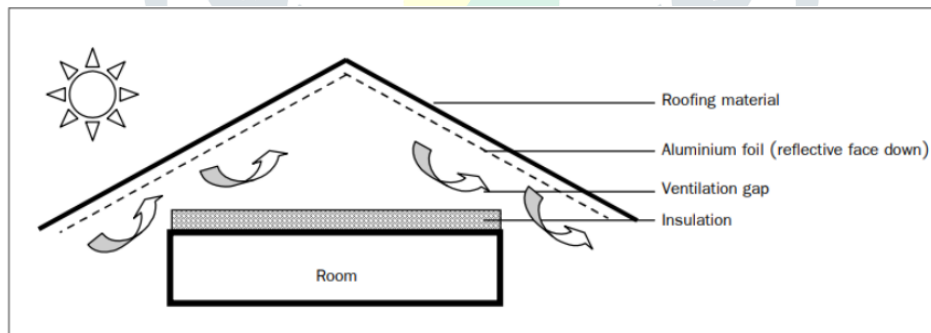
A schematic sketch of a roof section showing an example of a combined use of insulation and a ventilation space
